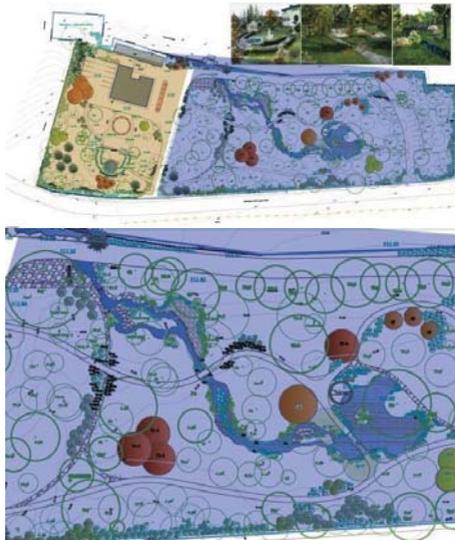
Plan with the proposed design and detail over the forest garden area (own source)
